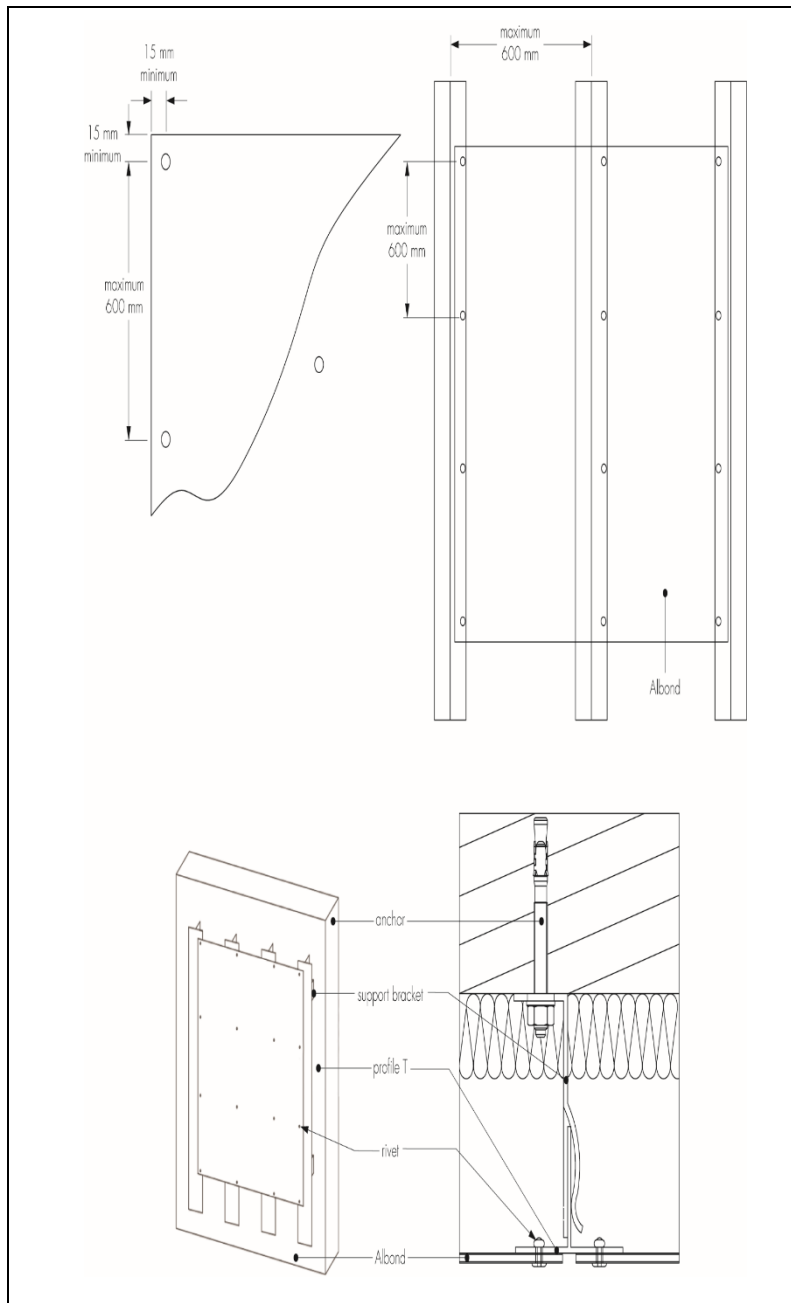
Typical installation details for Albond 9000/FR Cladding Panels (continued)
